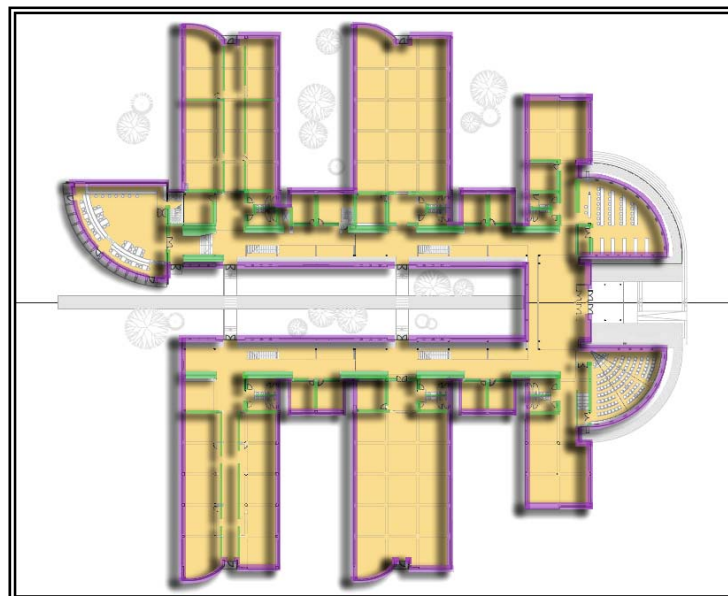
Adopted ground floor plan of METU Twins. *Source:* METU Technopolis Coordination Office.
